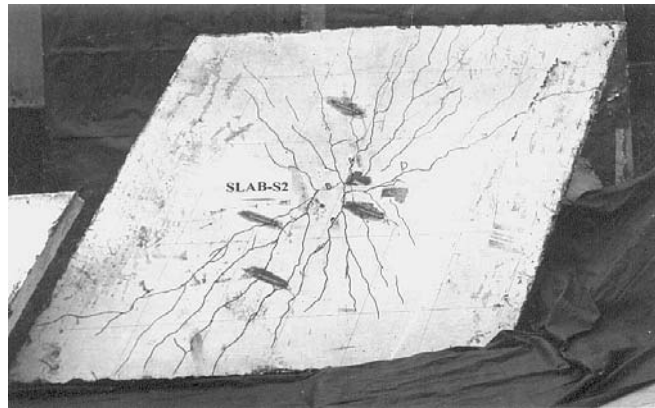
Cracks at failure on the tension side of the test Slab S2 (Single point load)
